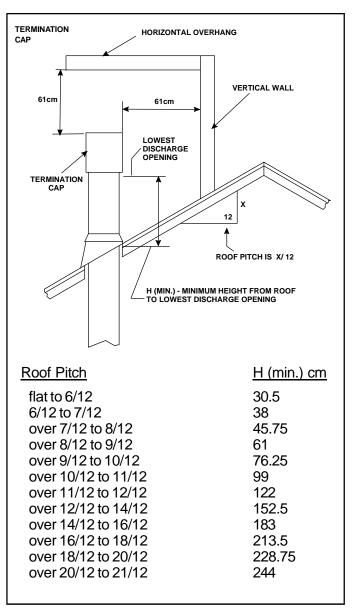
Minimum Height from Roof to Lowest Discharge Opening
